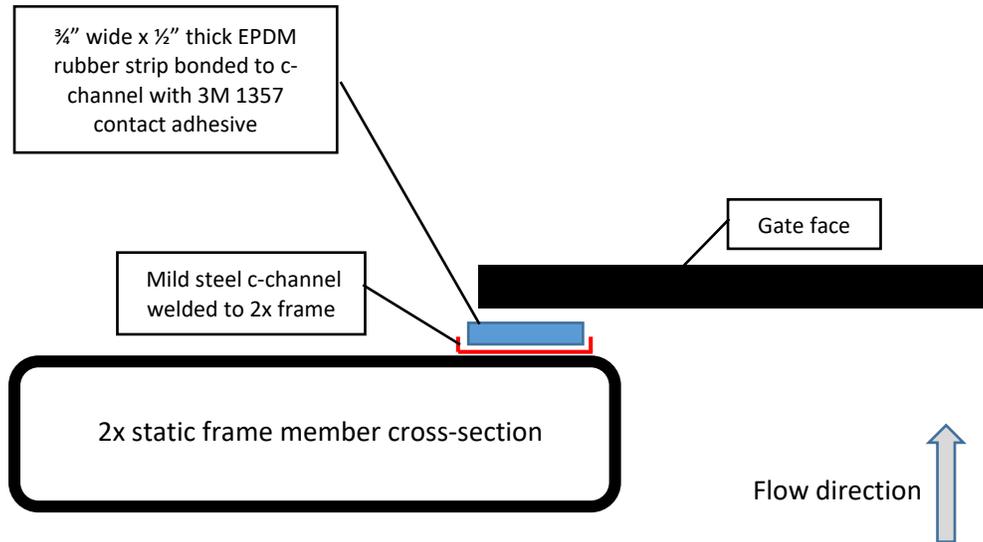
Cross-section view of the final gate to frame gasket assembly (plan view)
